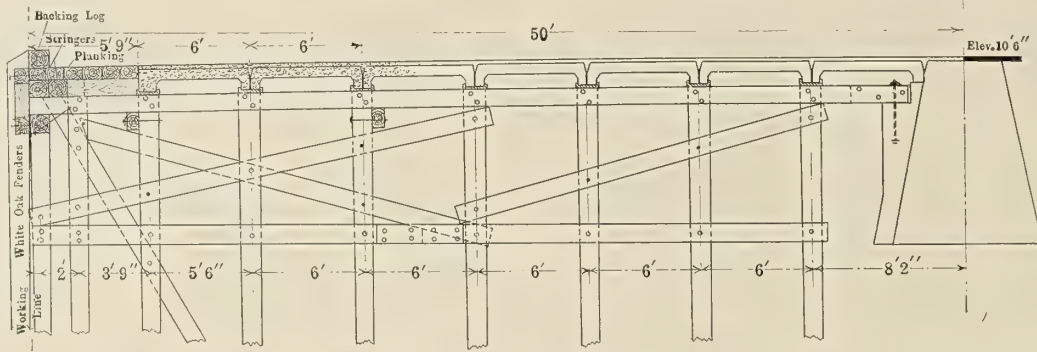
Section Through Wharf at Side of Central or Permanent Pier
